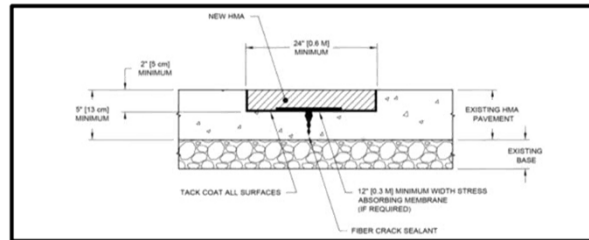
Partial depth crack repair in flexible pavement
